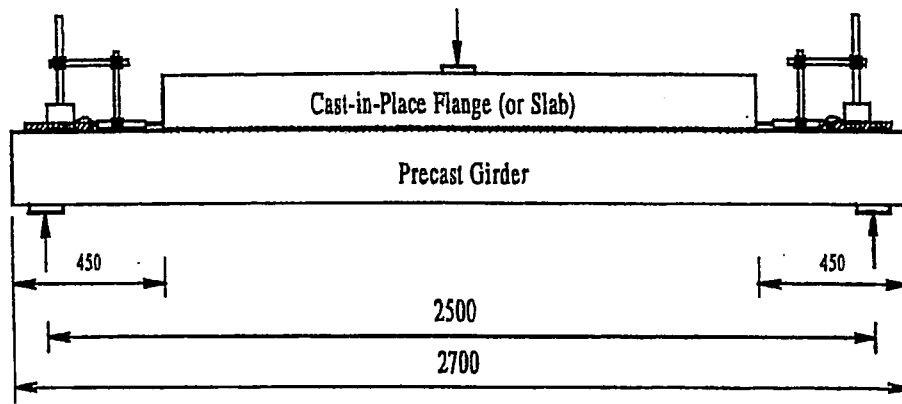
Elevation View of Loading Setup for the Beam Tests by Patnaik
